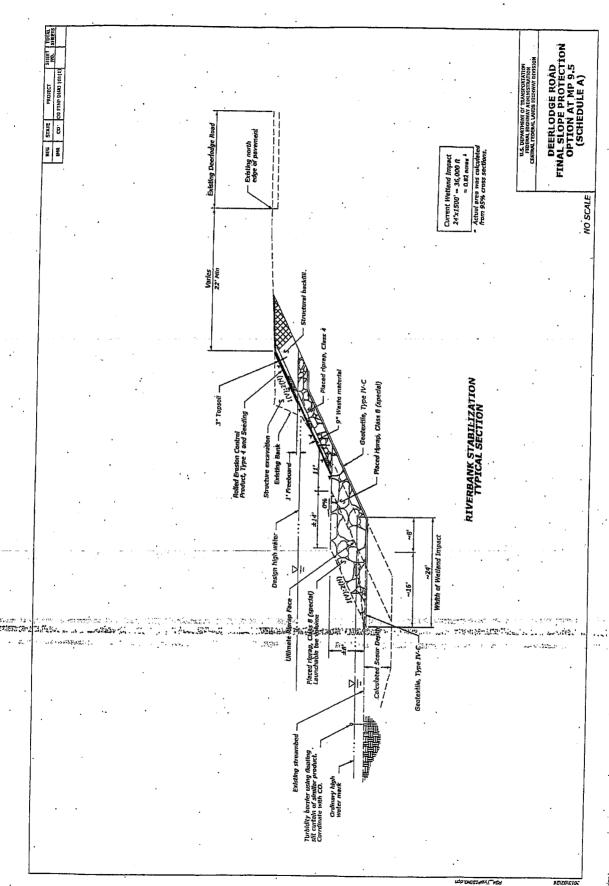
Typical Section for Exposed Riprap Bank Protection.
